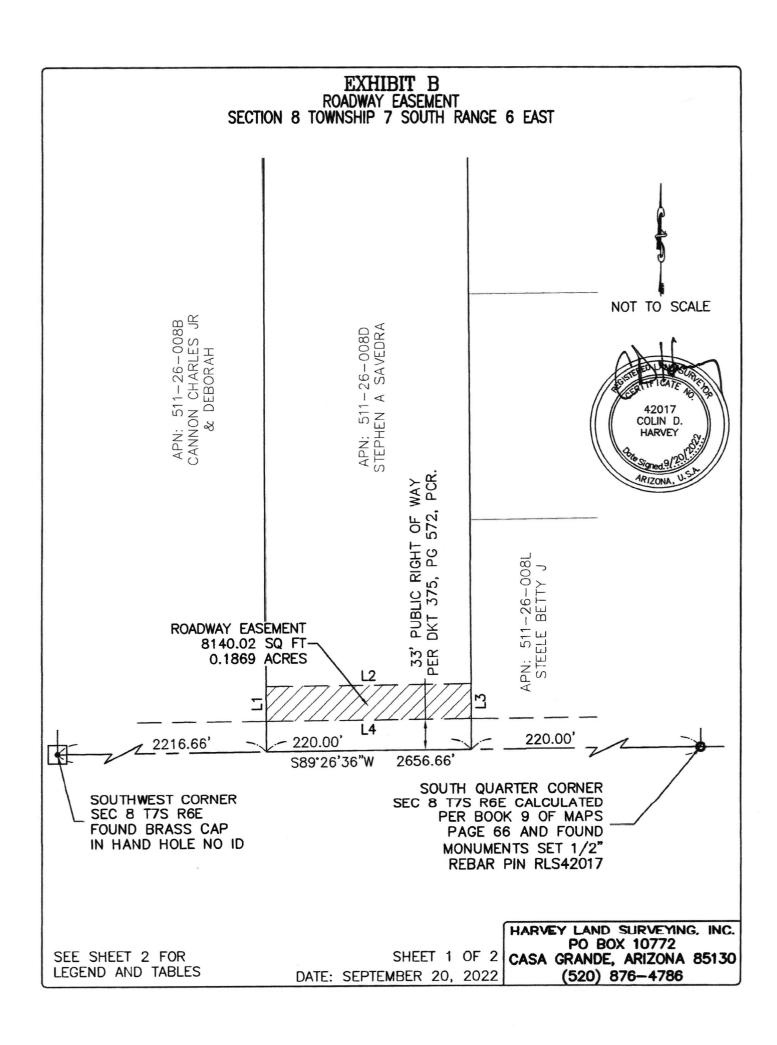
EXHIBIT B ROADWAY EASEMENT SECTION 8 TOWNSHIP 7 SOUTH RANGE 6 EAST
